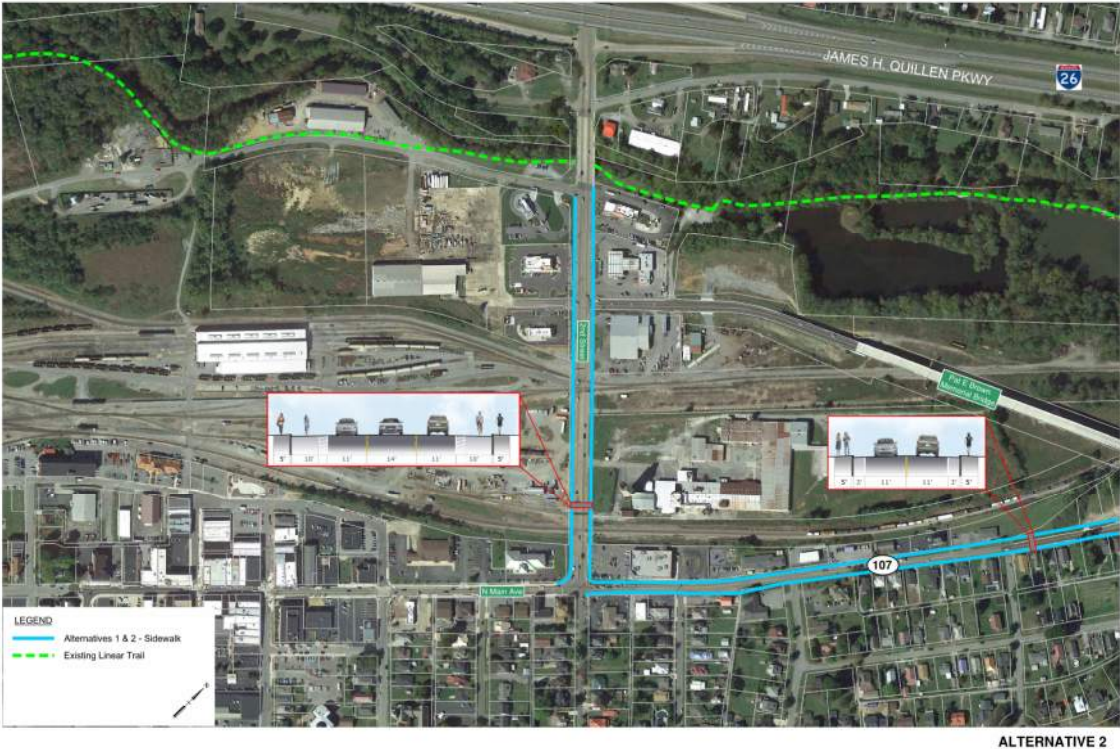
Erwin and Unicoi Recommended Alternatives 2 - Plan Sheets Page 2
